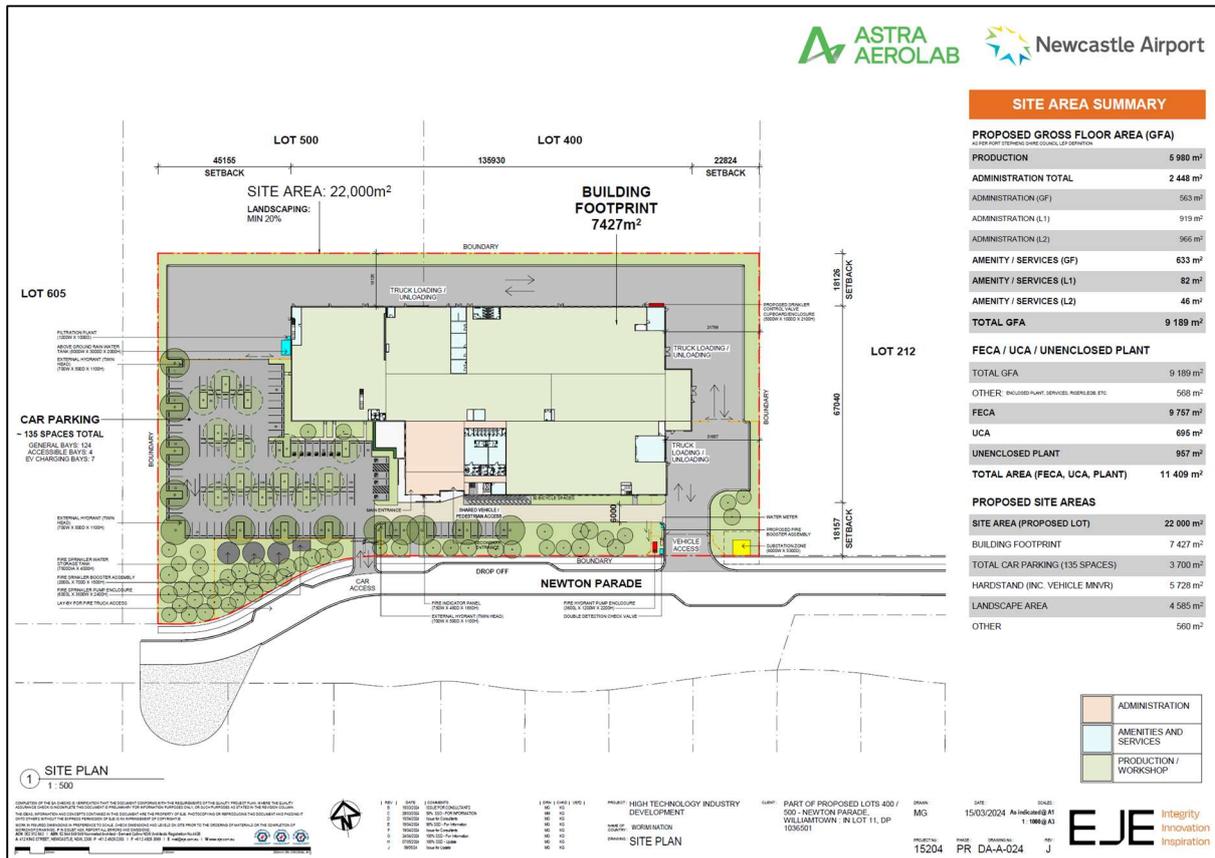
Site Plan. Source: EJE Architecture (May 2024)
